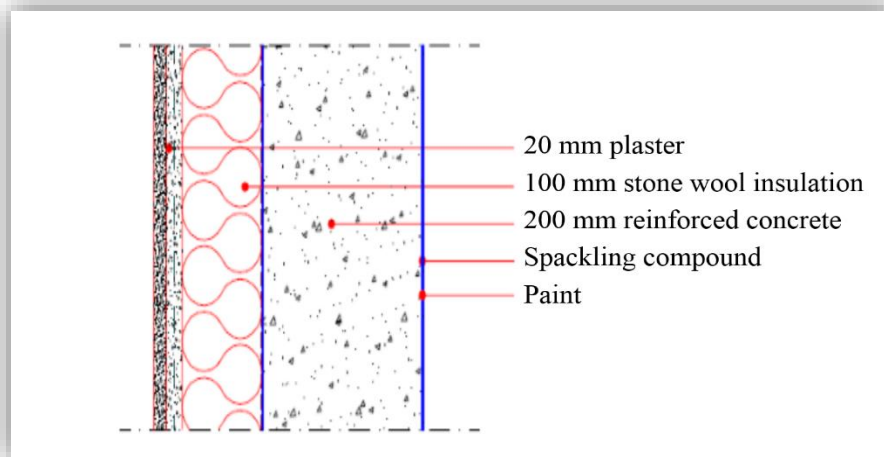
Reinforced concrete wall insulated outside with stone wool insulation
